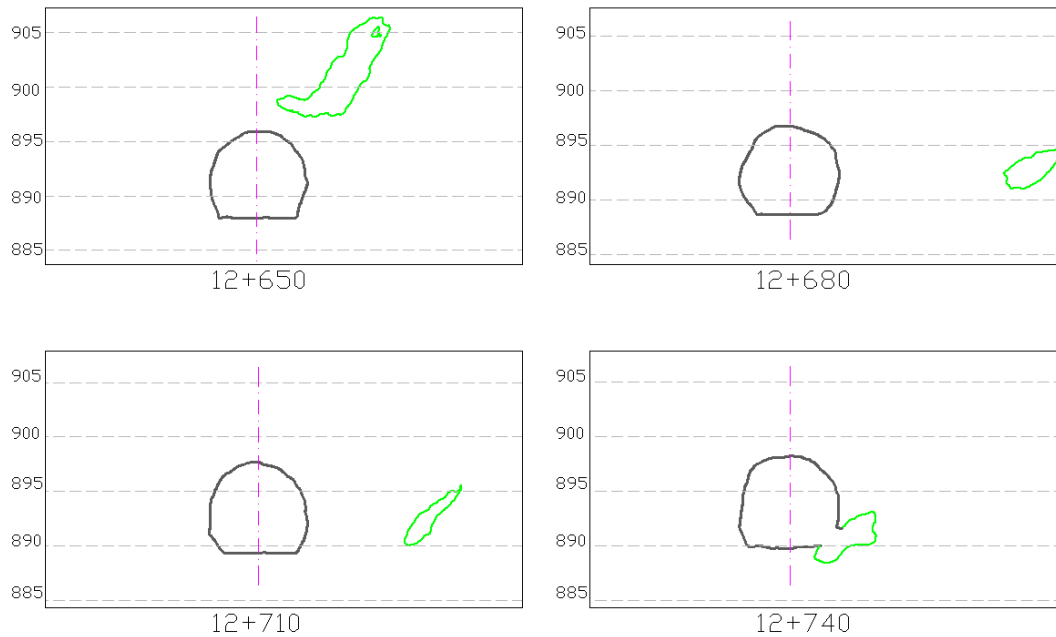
Cross-sections of the headrace tunnel showing the position of the El Hoyo de la Beba cavity
